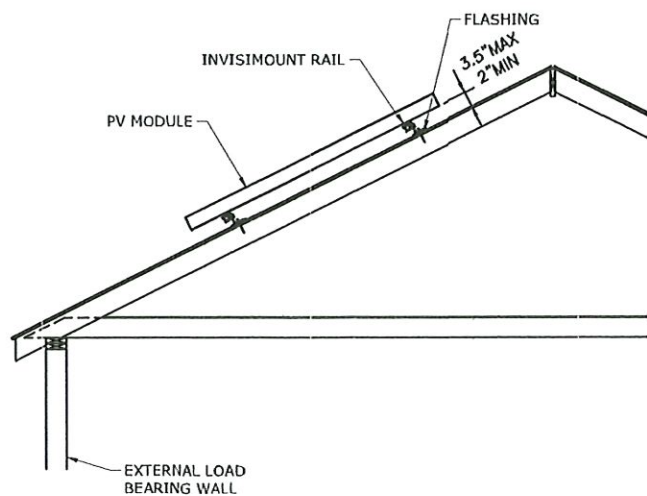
ROOF 4 STRUCTURAL FRAMING DETAIL
